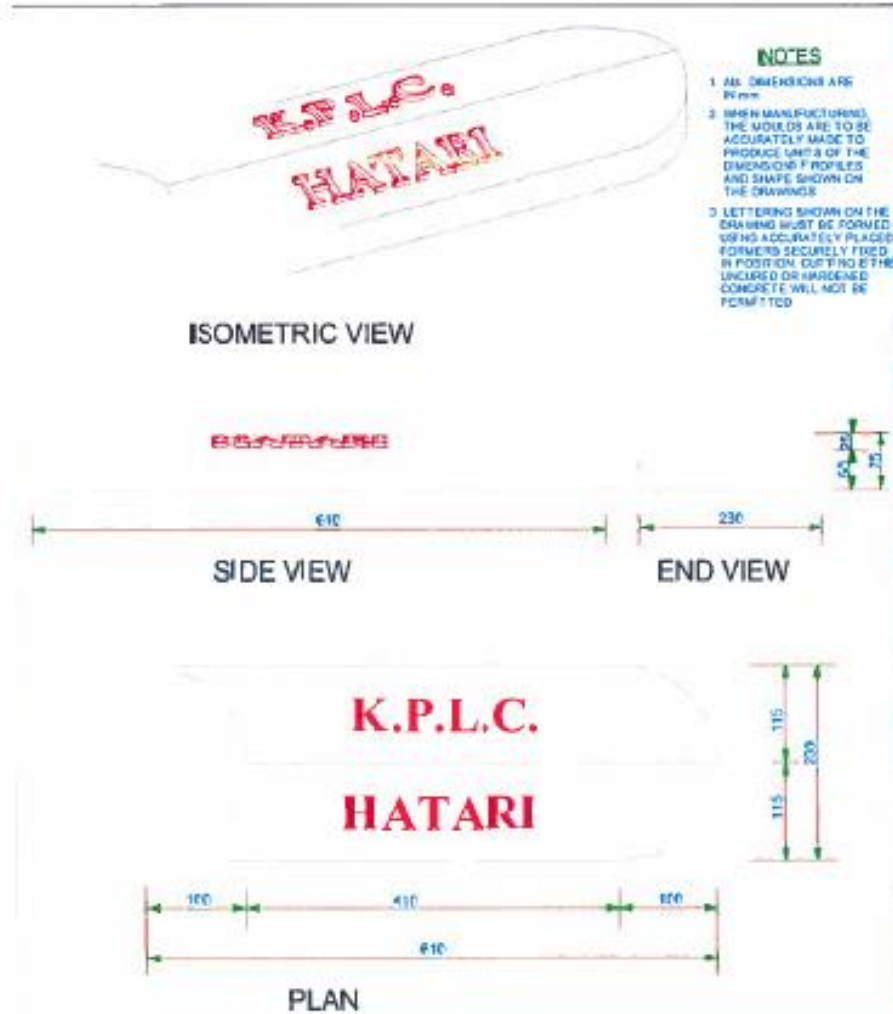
CONCRETE HATARI SLAB TO COVER H.T. CABLES
